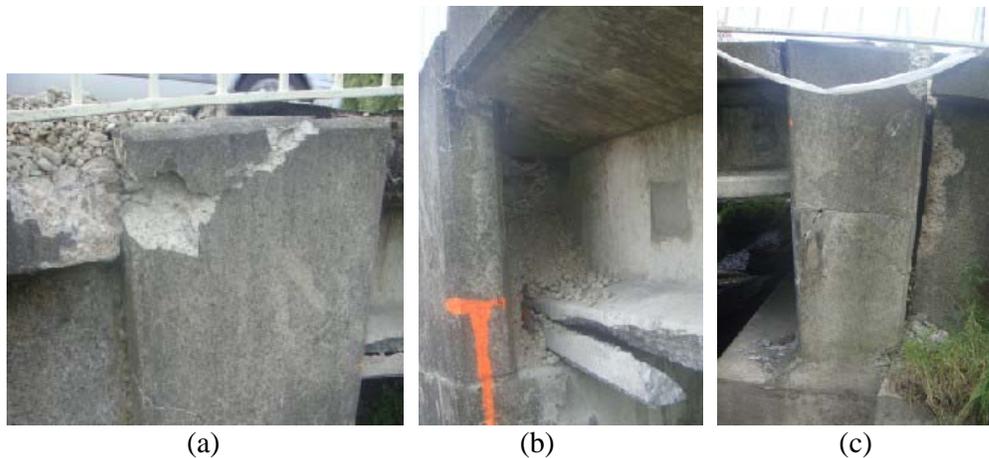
Pounding-induced damage to the Fitzgerald Avenue Bridge. Damage (a) at the abutment, (b) to the girder and (c) to the other abutment.
